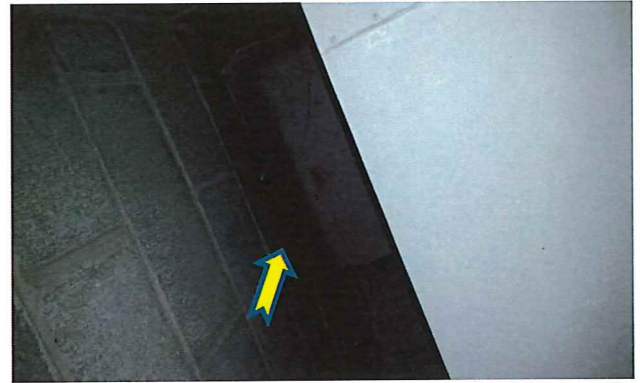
Example of exposed coffer recessed in soffit of concrete slab in a service area where there is no false ceiling installed.
